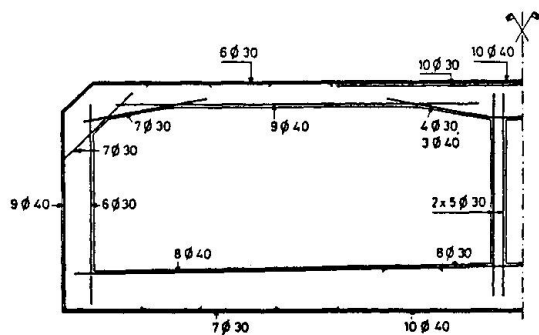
Tunnel reinforcement for a 1.5 m wide section
